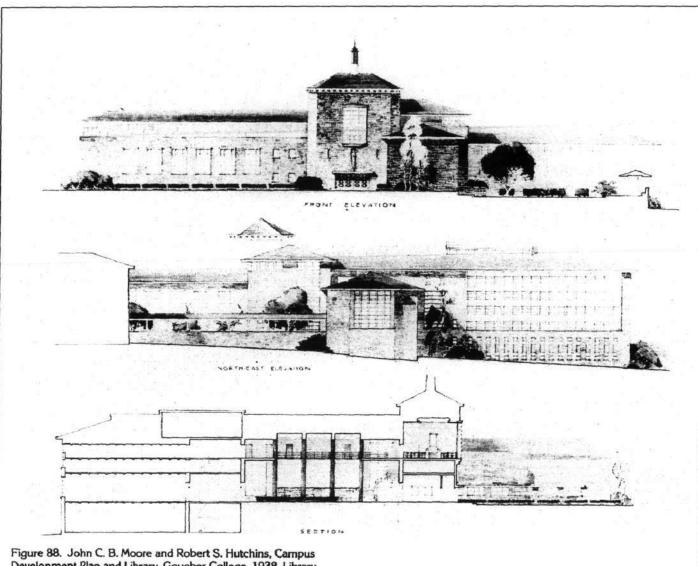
John C. B. Moore and Robert S. Hutchins, Campus Development Plan and Library, Goucher College, 1938. Library elevations and section. (Photo courtesy Goucher College.)
